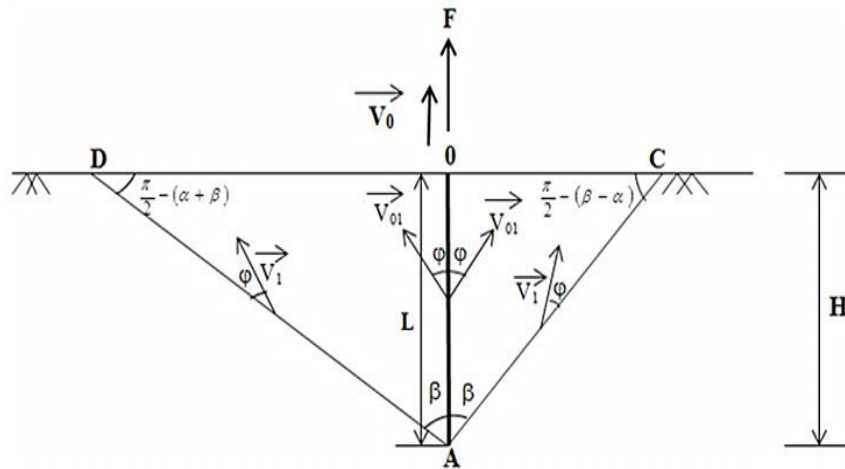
The failure mechanism of vertical grouted soil anchor (Mekki et al., 2009).
